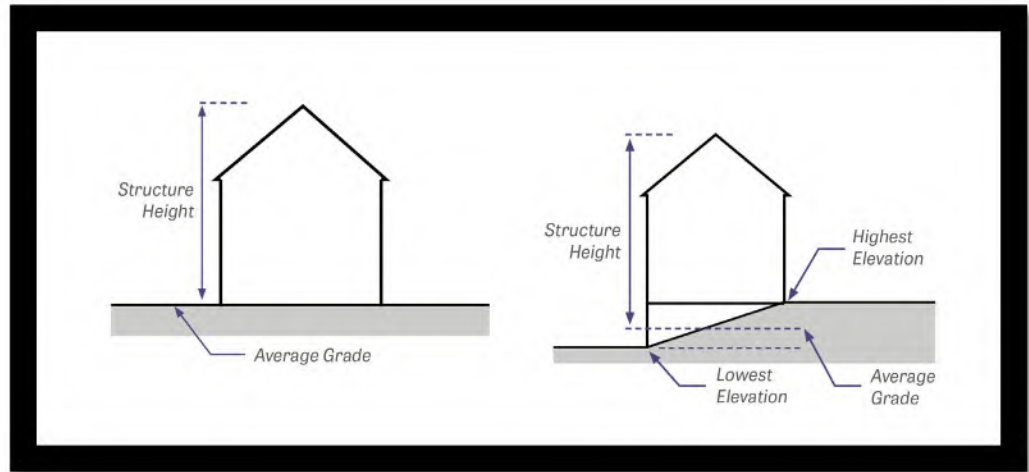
Measuring structure height on flat ground plan and sloped ground plane.
